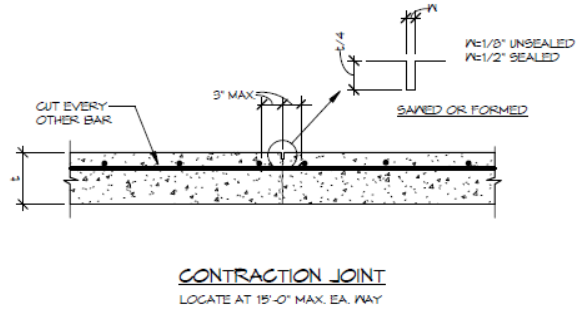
Typical contraction joint used to control random cracking in the floor slab
